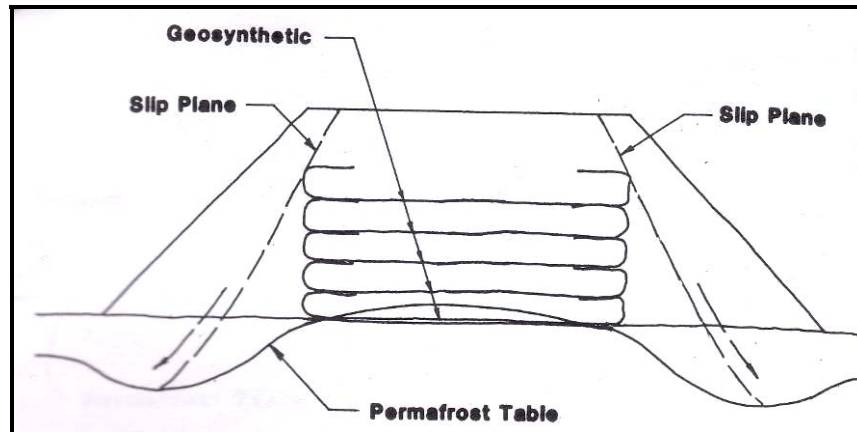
Core embankment reinforced with geotextiles (pillow) (Rooney and Johnson, 1988)
